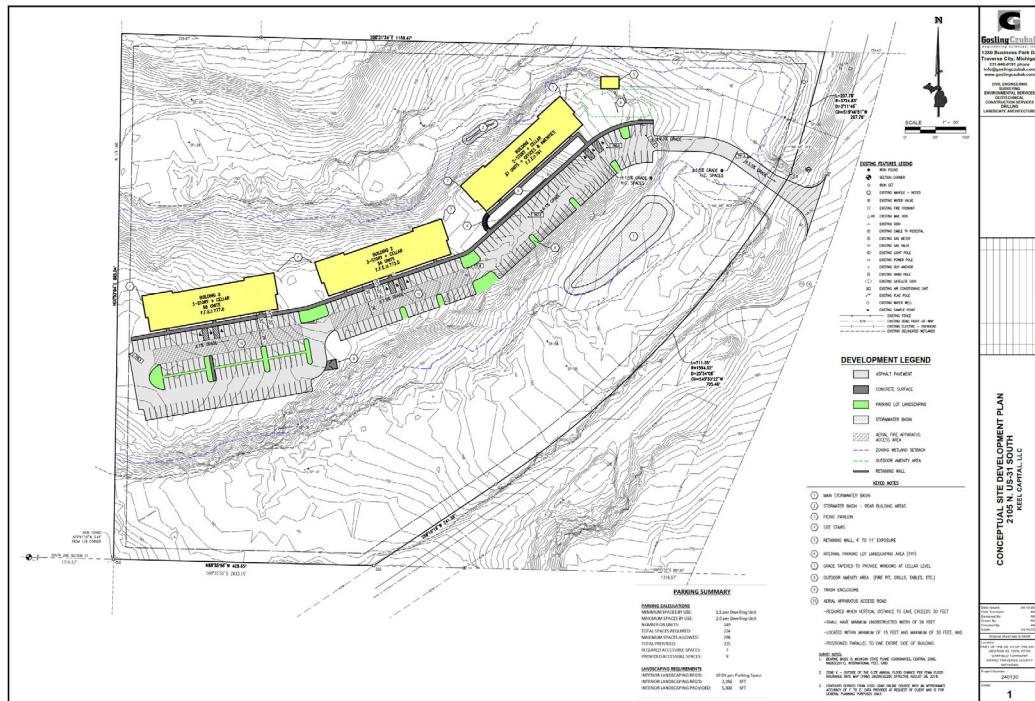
EXHIBIT ADEVELOPMENTSite Survey and Legal DescriptionConceptual Site Plan
